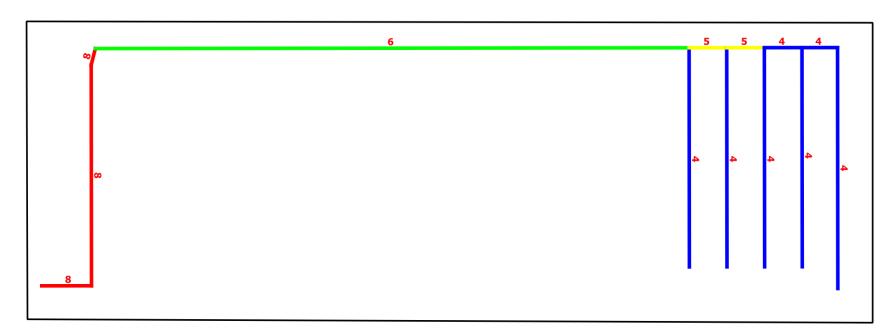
Layout pipe sizes from after running the Network Pipe Sizing
